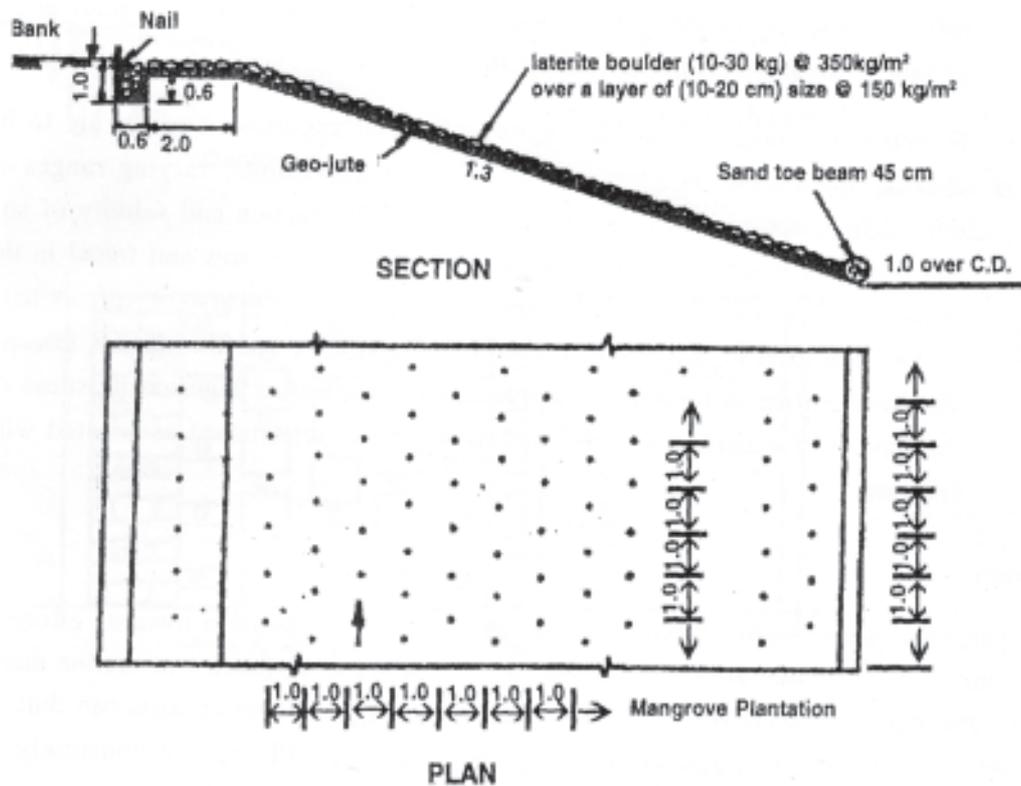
Typical Sectional Elevation & Plan for bank protection & mangrove plantation (Boulder type)
